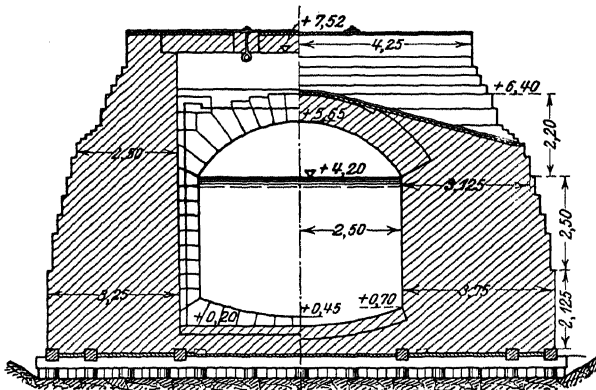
Cross-section of the new Marien sluice. The left half shows the outer elevation; the right half a cross-section through the center of the sluice
